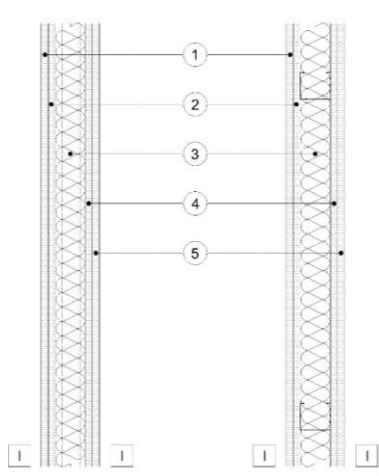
Interior wall construction: vertical section on the left, horizontal section on the right
